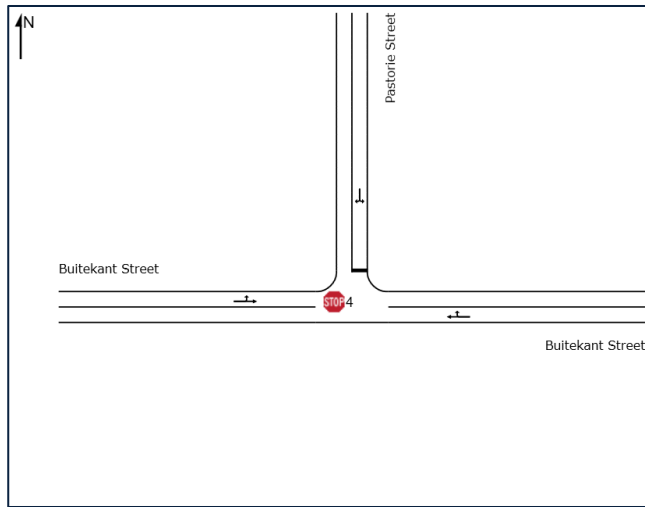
Buitekant Street and Pastorie Street: Existing Layout
